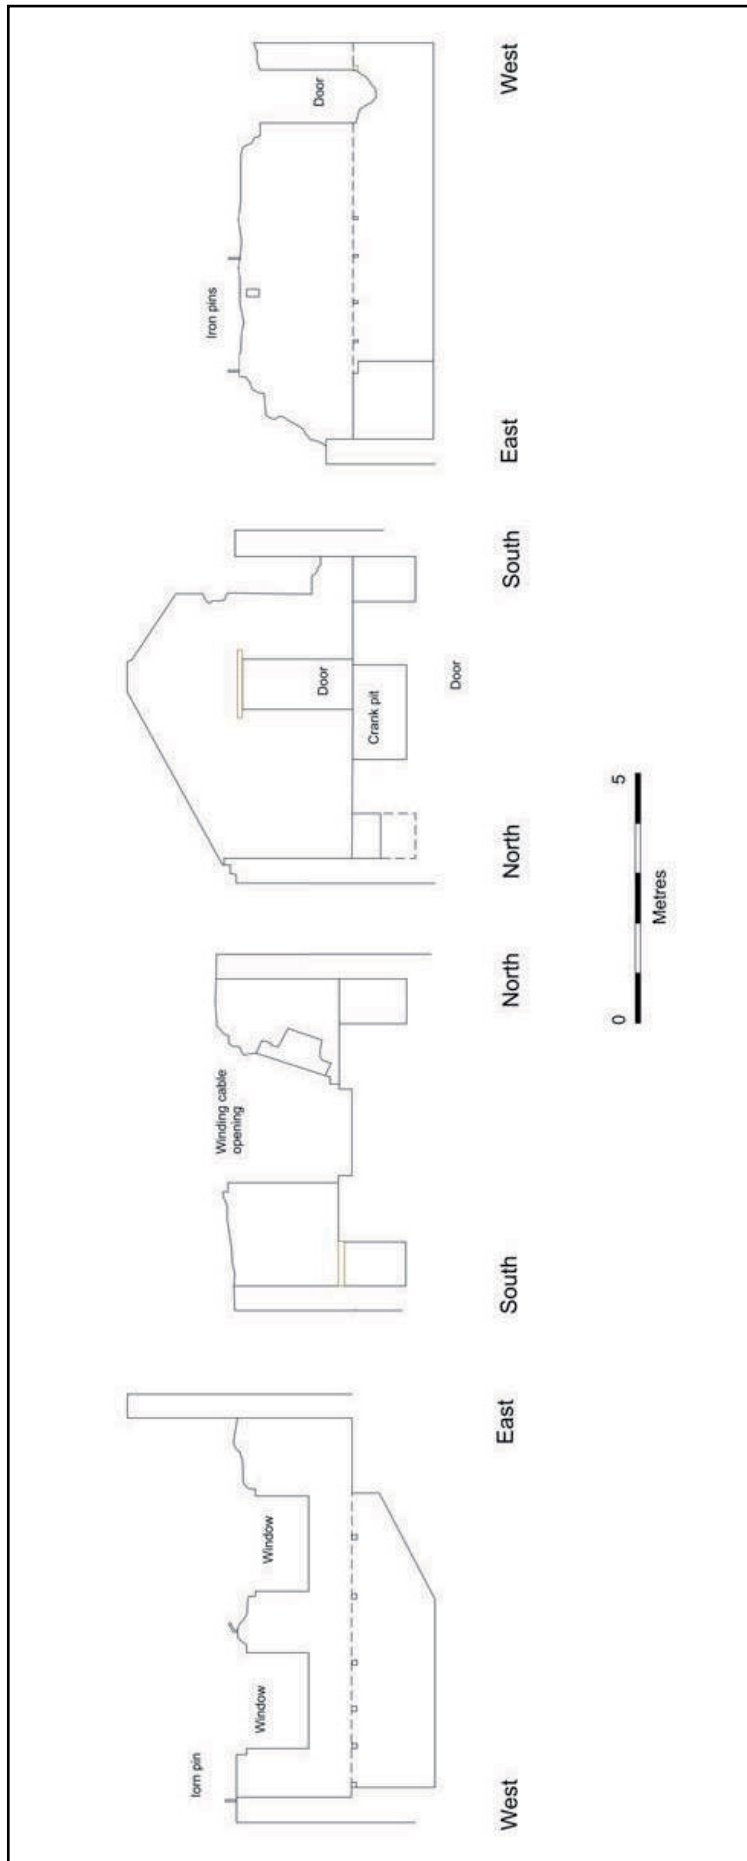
Internal elevations of horizontal winding engine house [190376] at Wheal Coates.
